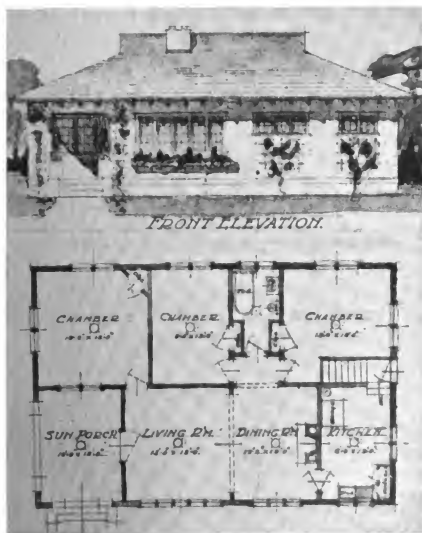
ELEVATION AND PLAN OF SMALL CONCRETE BUNGALOW.
